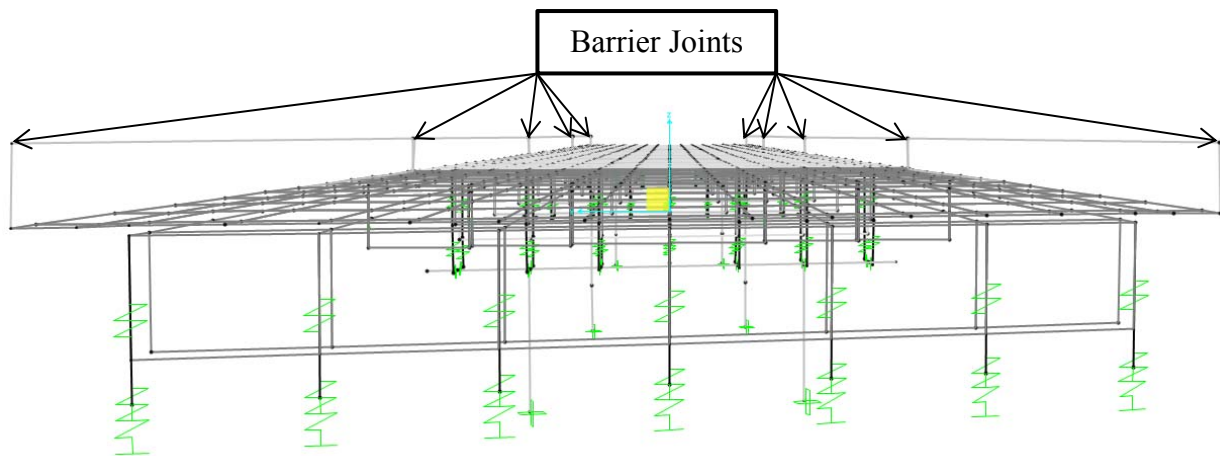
Non-extruded view of barrier joint locations on bridge model.
